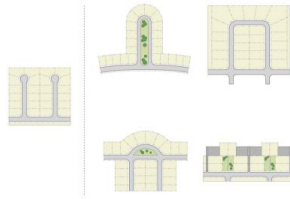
Disconnected Street Options. Where streets will not connect, blocks and lots should be laid out to limit the need for cul-de-sacs and minimize other options such as loop, close, weave and cul-de-sacs. (Section 17-3-1.5)
